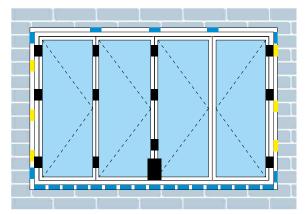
A Folding sliding frame glass shiming with load on the lower track
